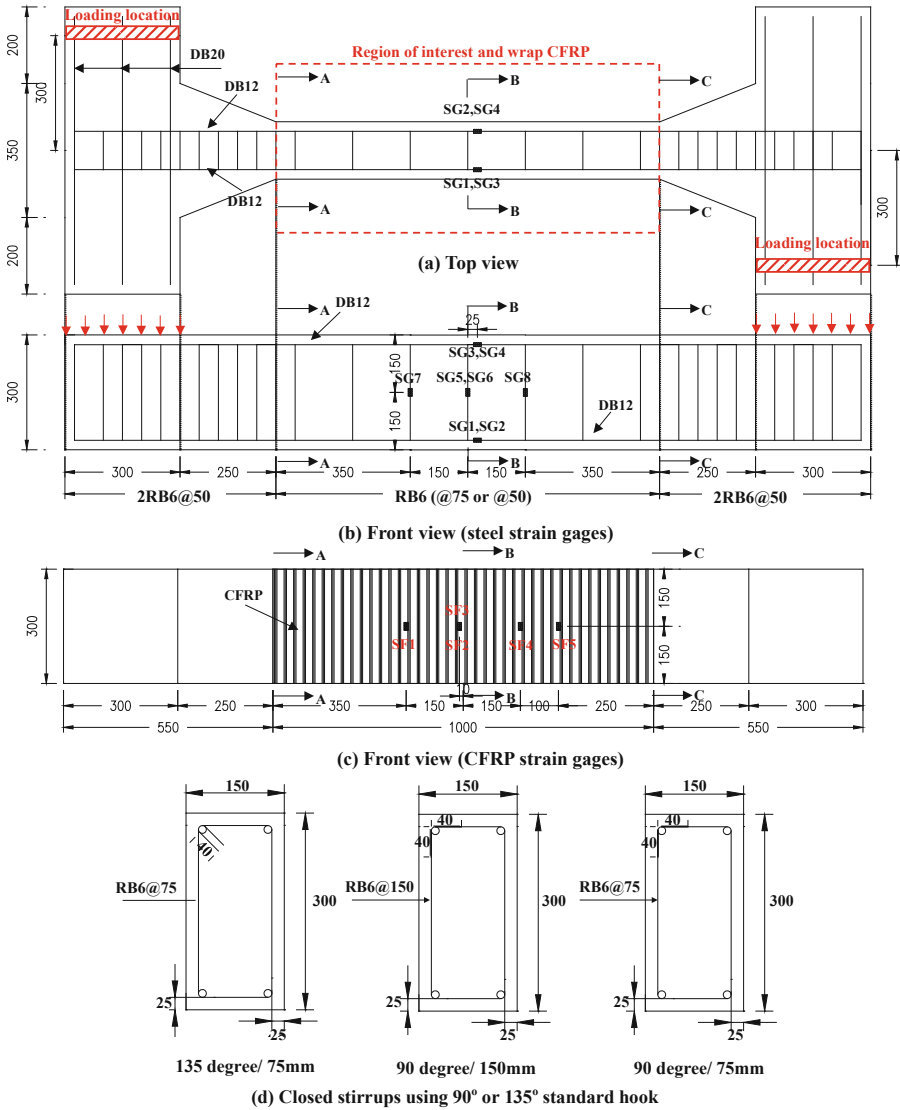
Details of tested RC specimens (Dimensions in mm).
